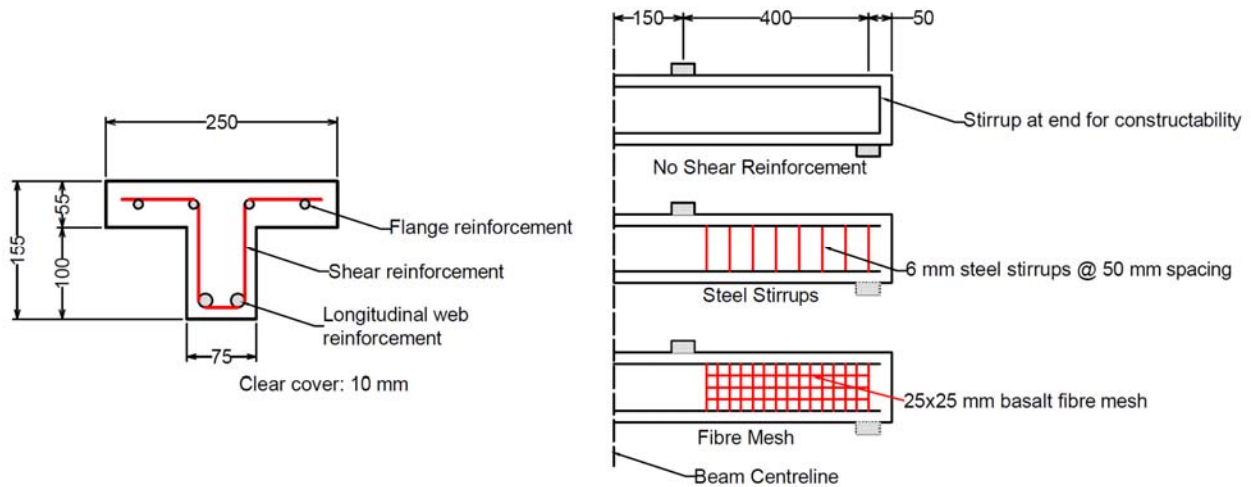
Beam designs showing cross section layout and shear reinforcement types. All dimensions in mm.
